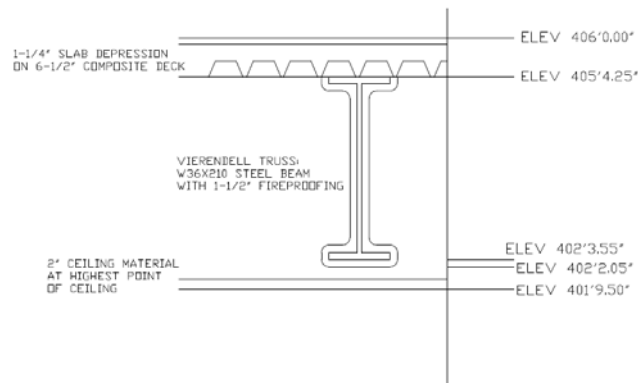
Lecture Hall – Simplified Section of Vierendell Truss with Measurements
